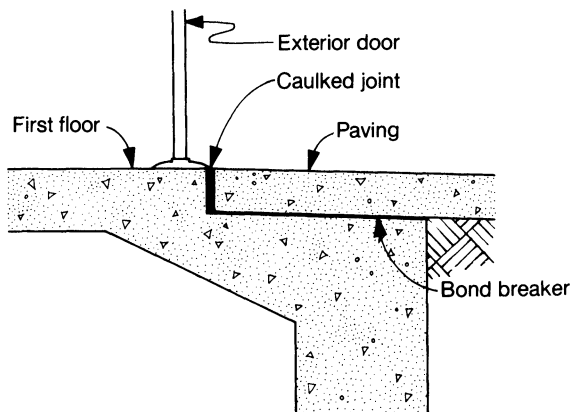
Basement wall with a recessed entrance and exterior paving.
